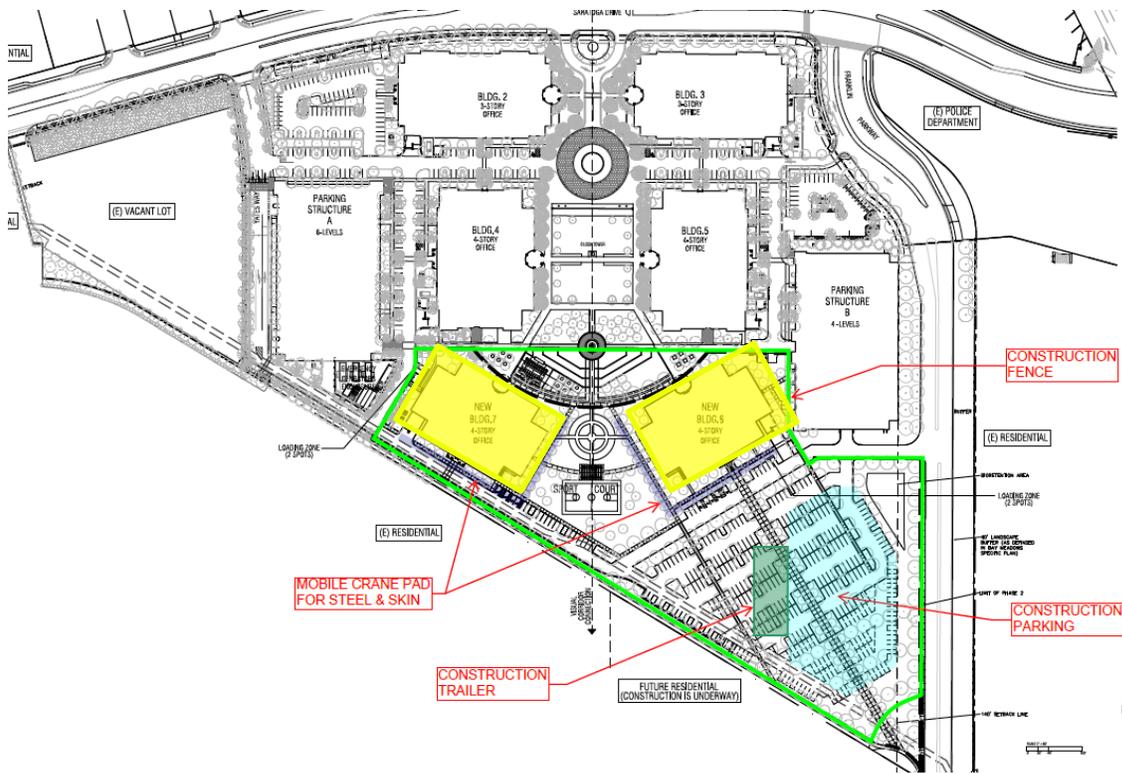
Site Plan. Construction fence perimeter shown in green. Locations of new buildings marked in yellow.
